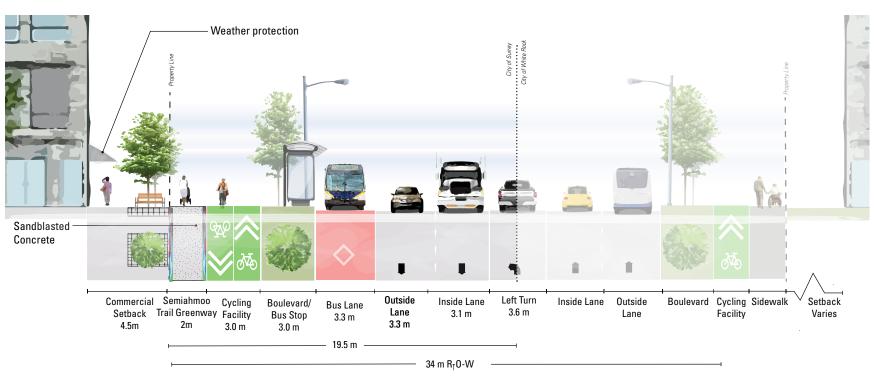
B: 16 Avenue between Martin Drive and 152 Street
